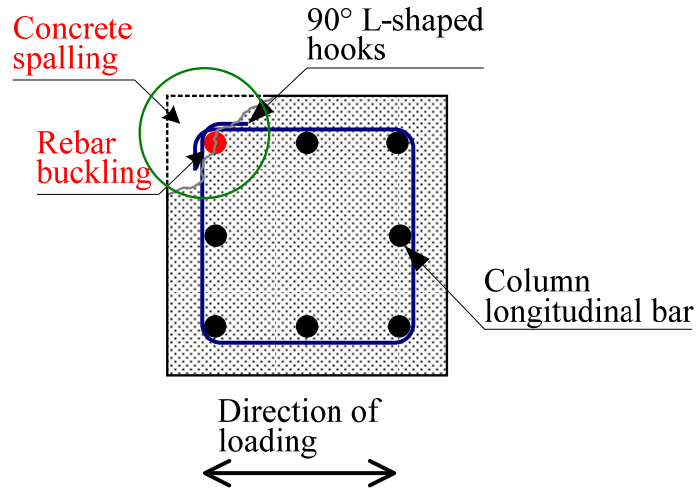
Failure of a non-ductile RC column with 90 degree L-shaped column ties
